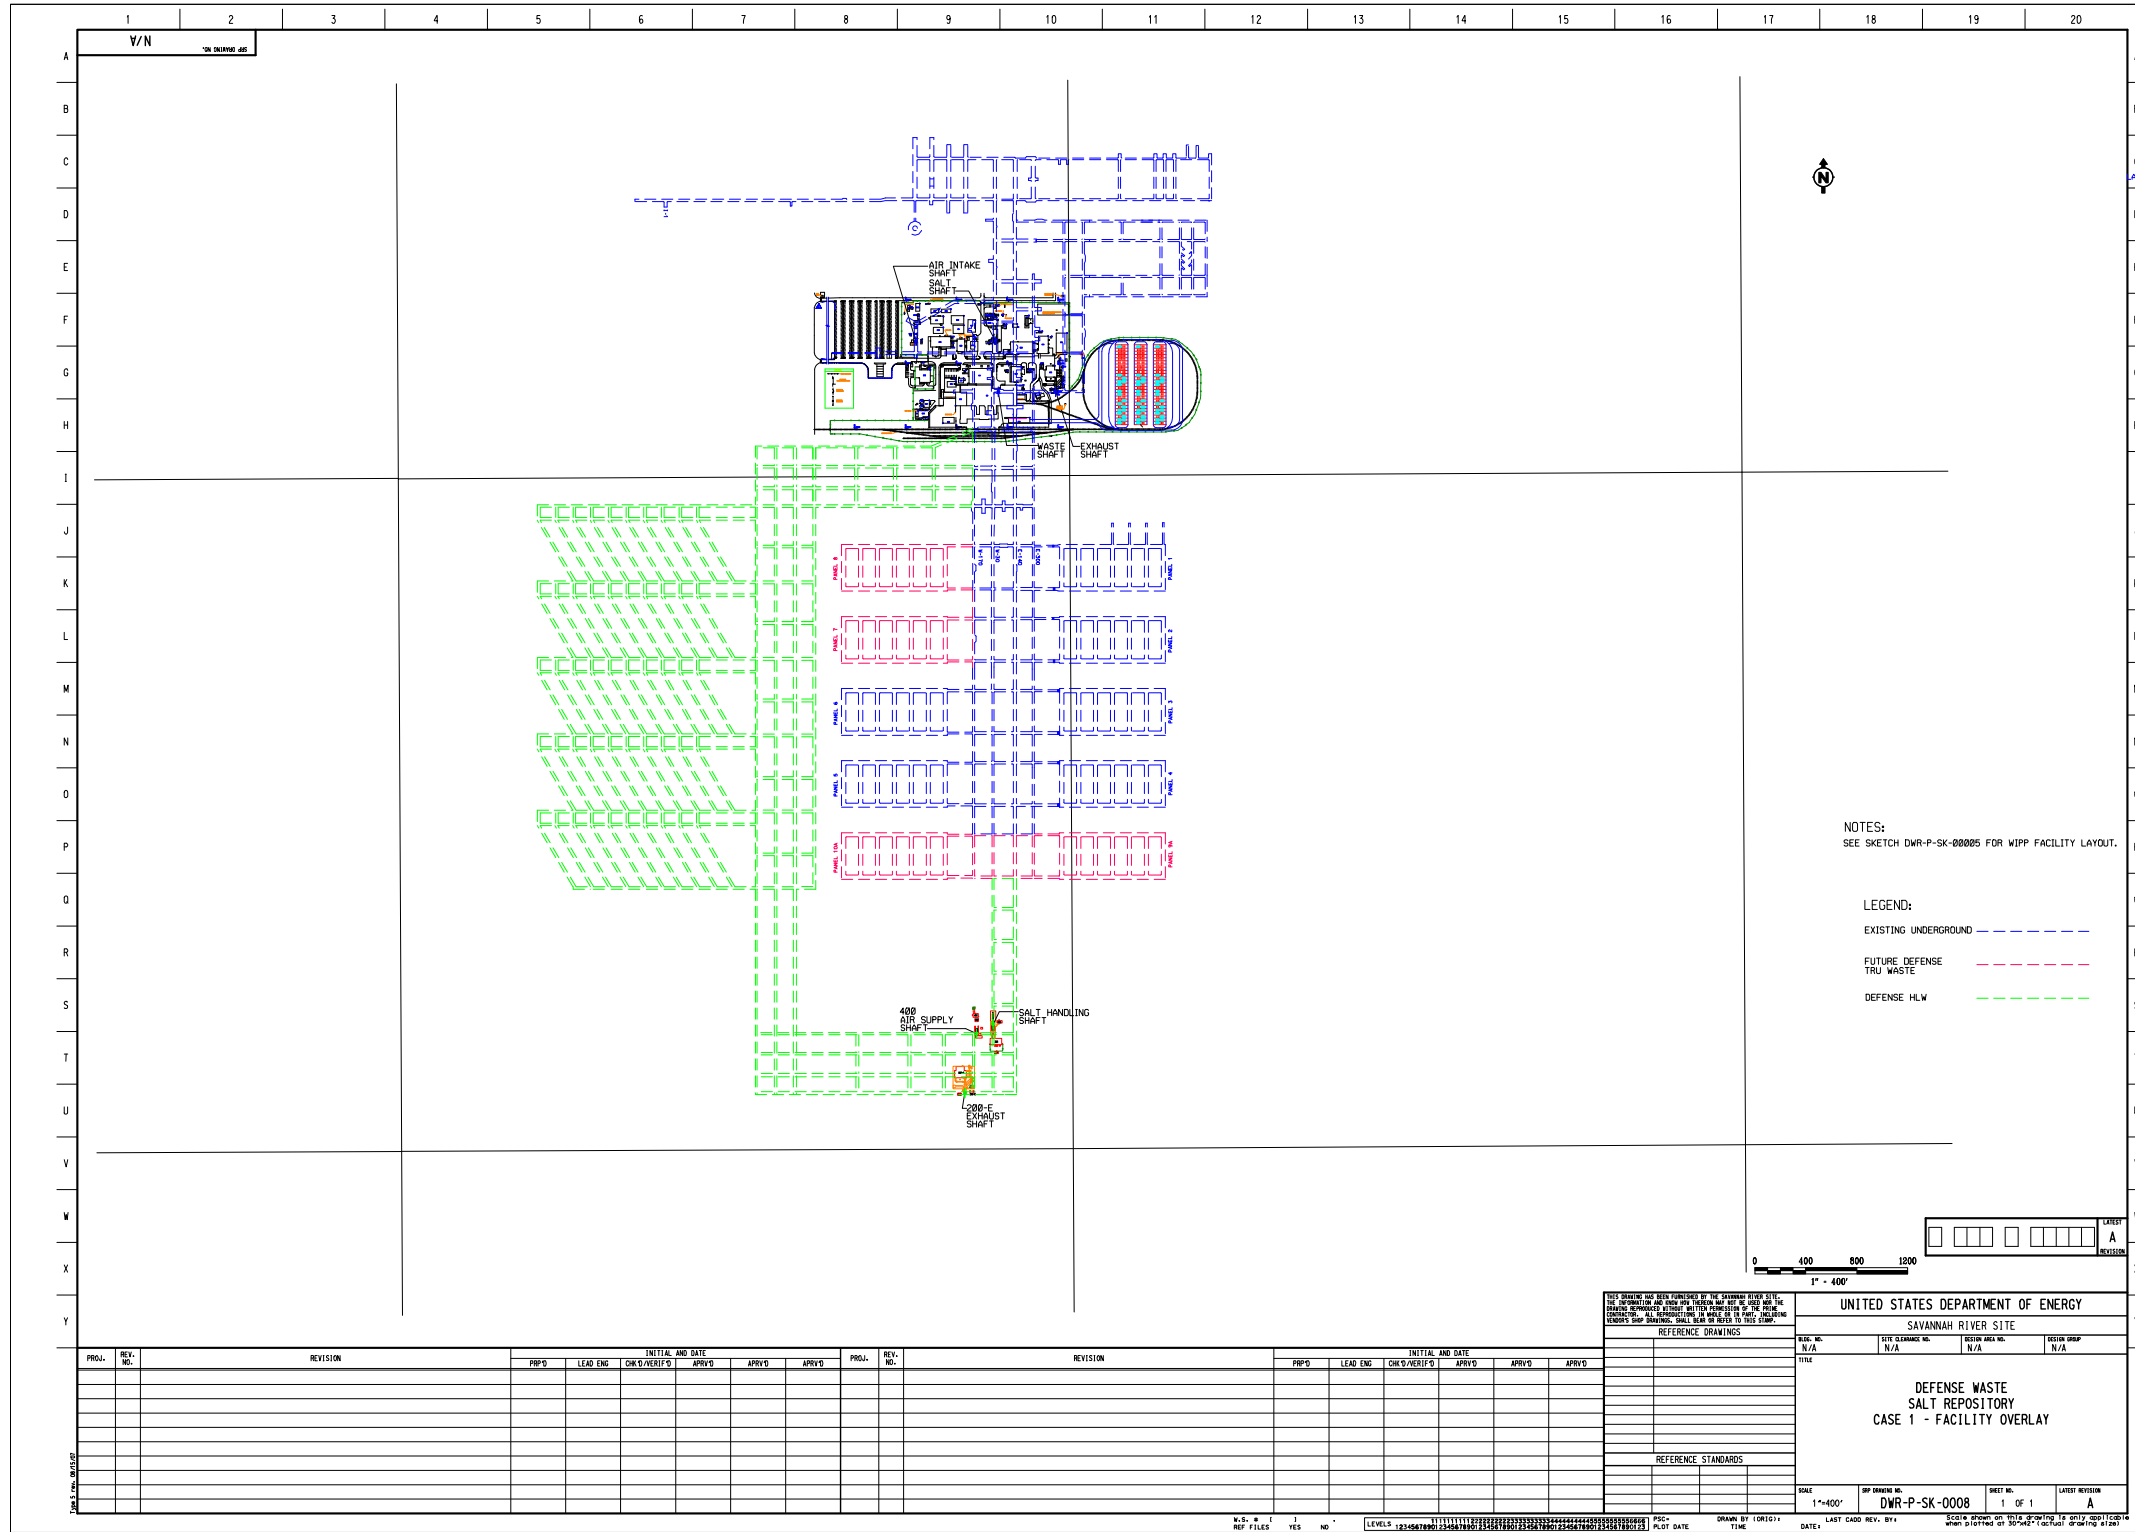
Case 1 Surface Facilities and Underground Overlay
